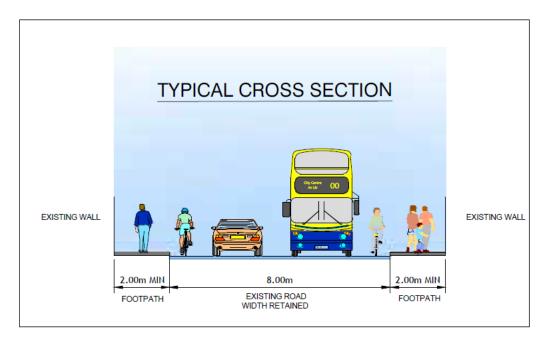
Typical Cross-Section on Kimmage Road Lower in Section 1
